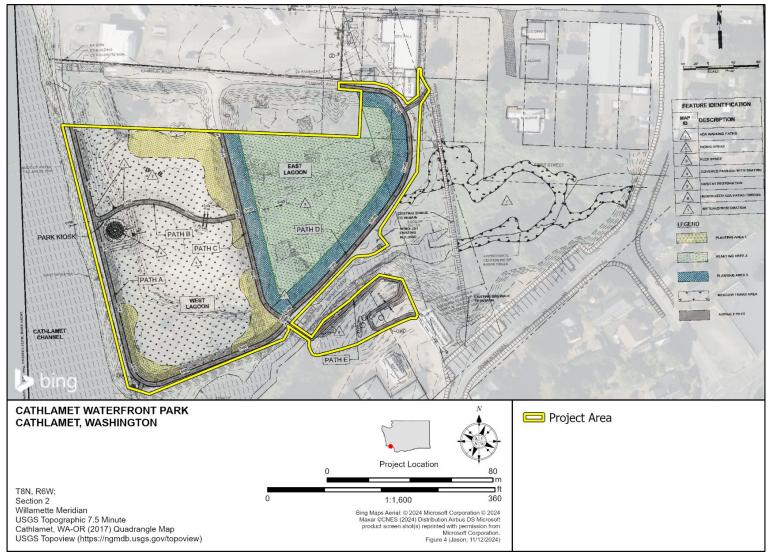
Construction plans for the Cathlamet Waterfront Park project showing features and plantings proposed for the project. The deepest impacts will be along Path B, an east-west oriented path crossing the former west lagoon, where excavation will extend as deep as 2 m (6.3 ft) below the surface. All work within the former lagoons will be confined to fill.
